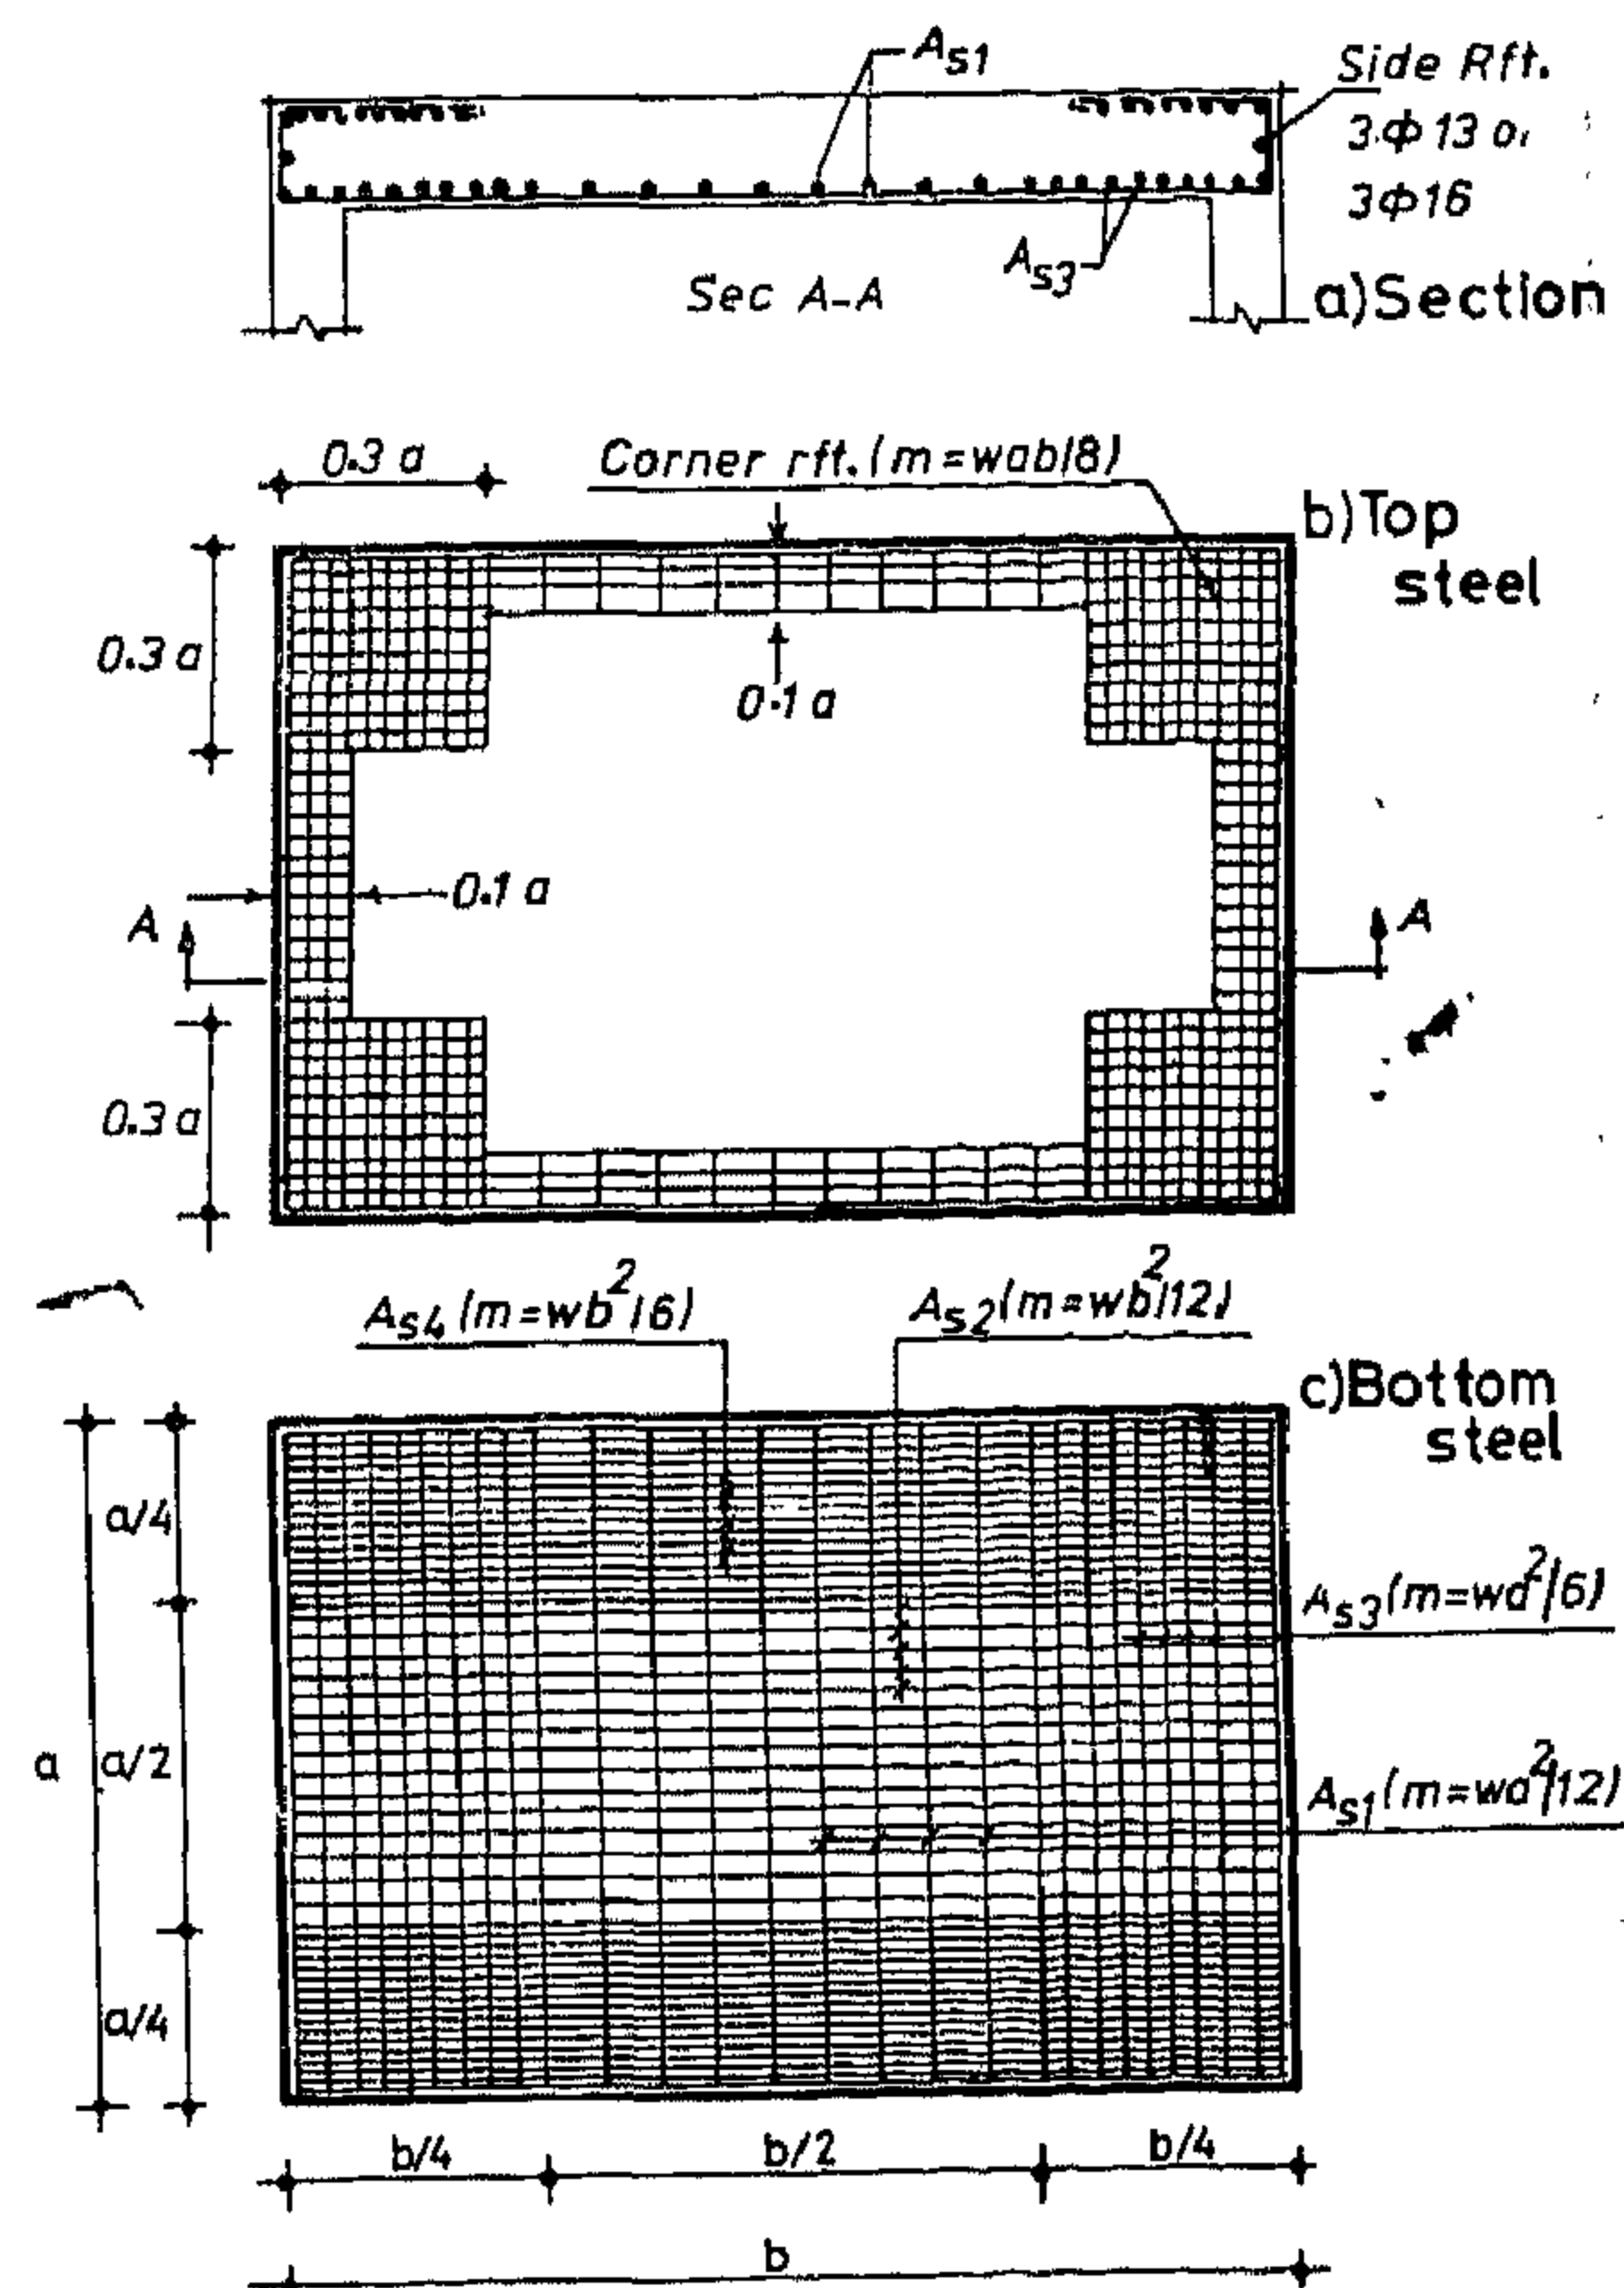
Recommended steel arrangement for rectangular slab supported on four columns under uniform loads
